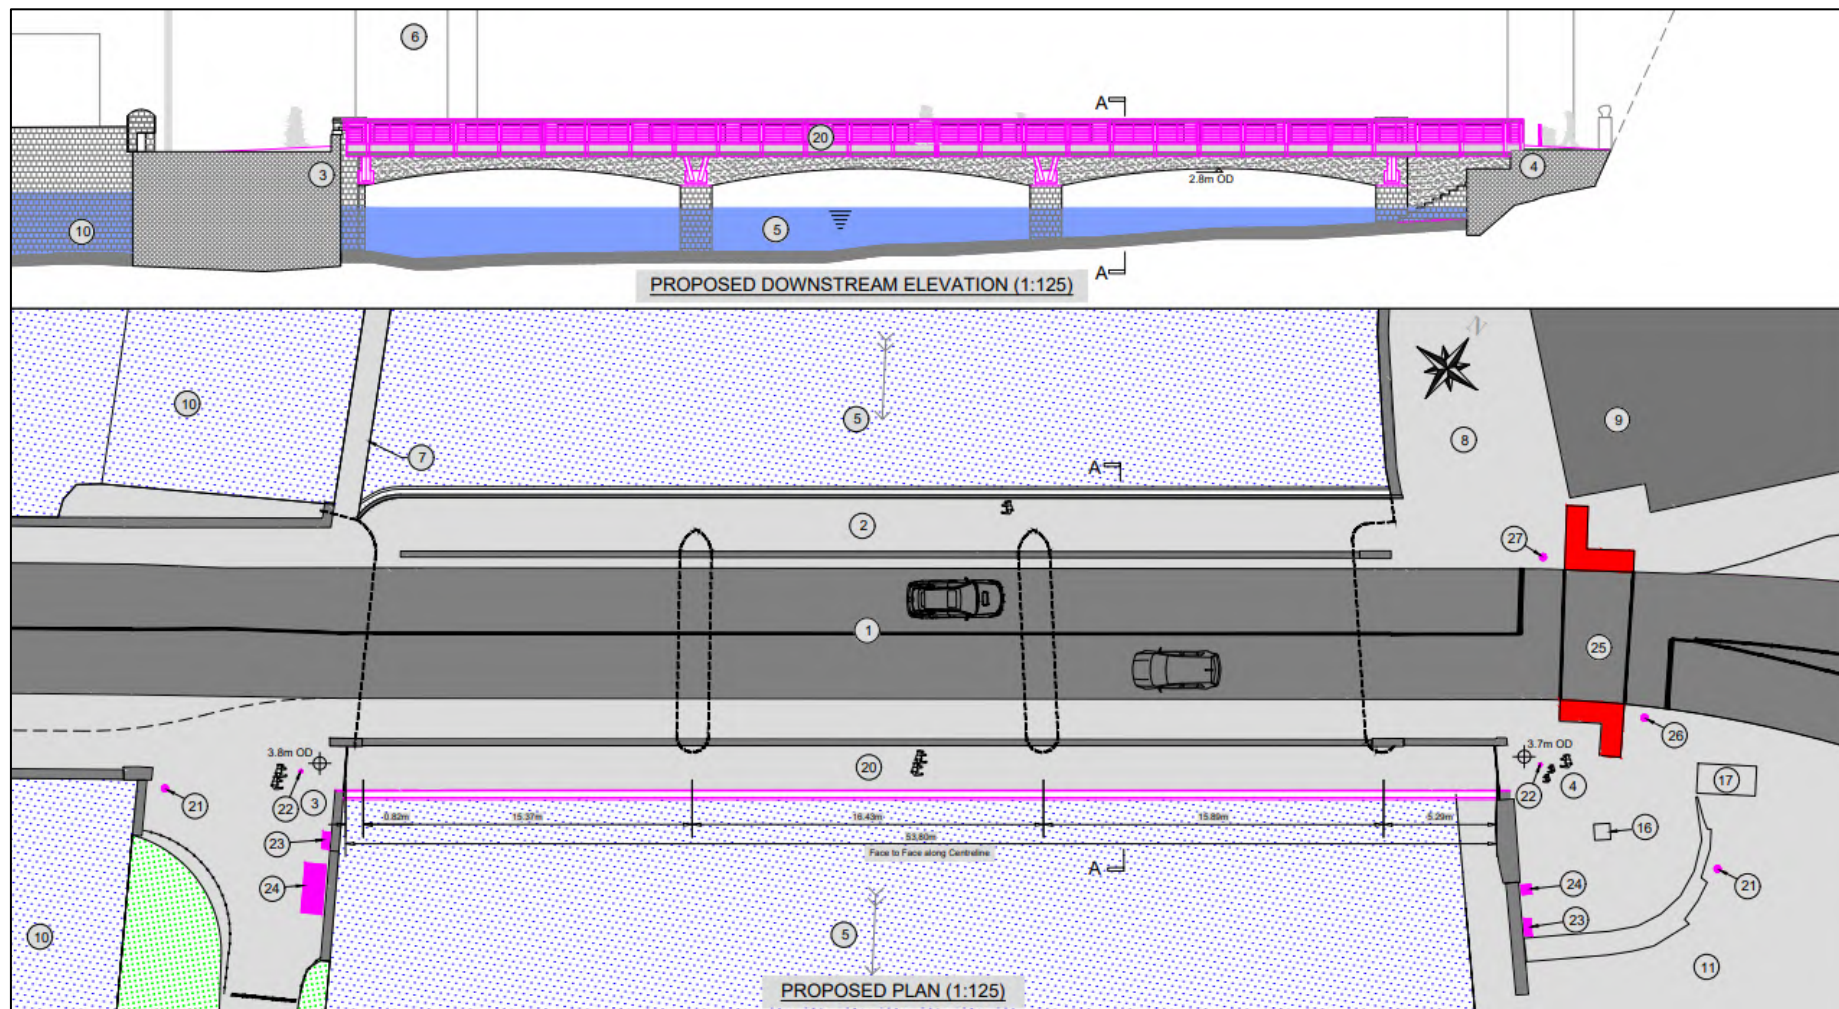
Elevation and Plan of Proposed Pedestrian Bridge
